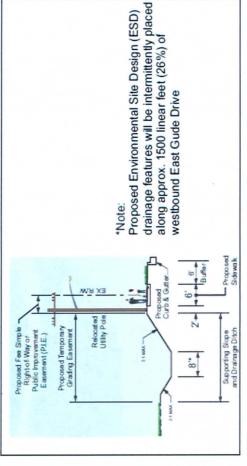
Environmental Site Design (ESD) Typical Ditch Section.
